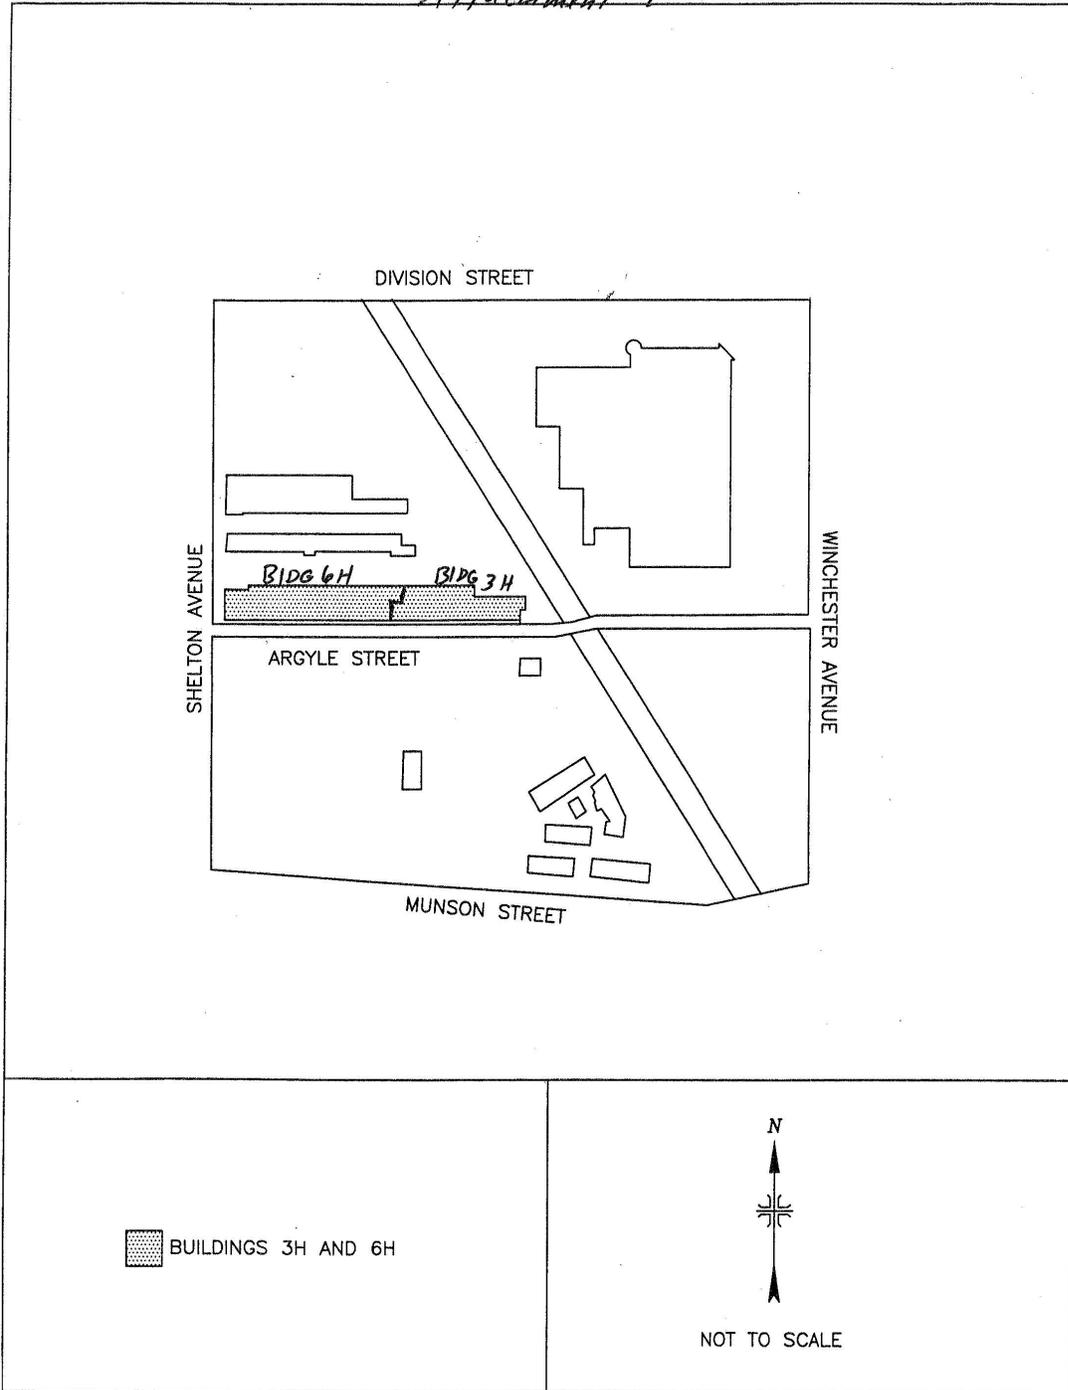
Layout of Science Park – Location of Buildings 3H and 6H
